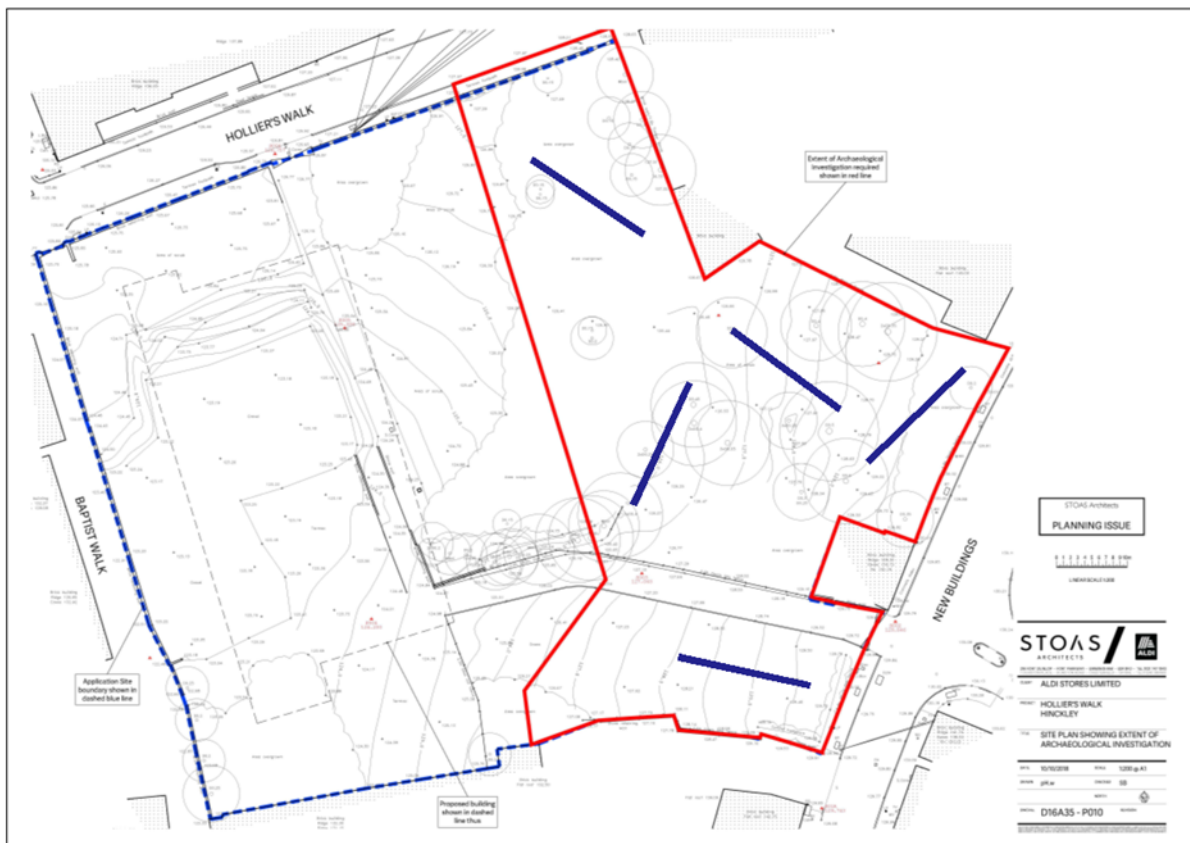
Proposed trench plan showing the investigated area (outlined red).
